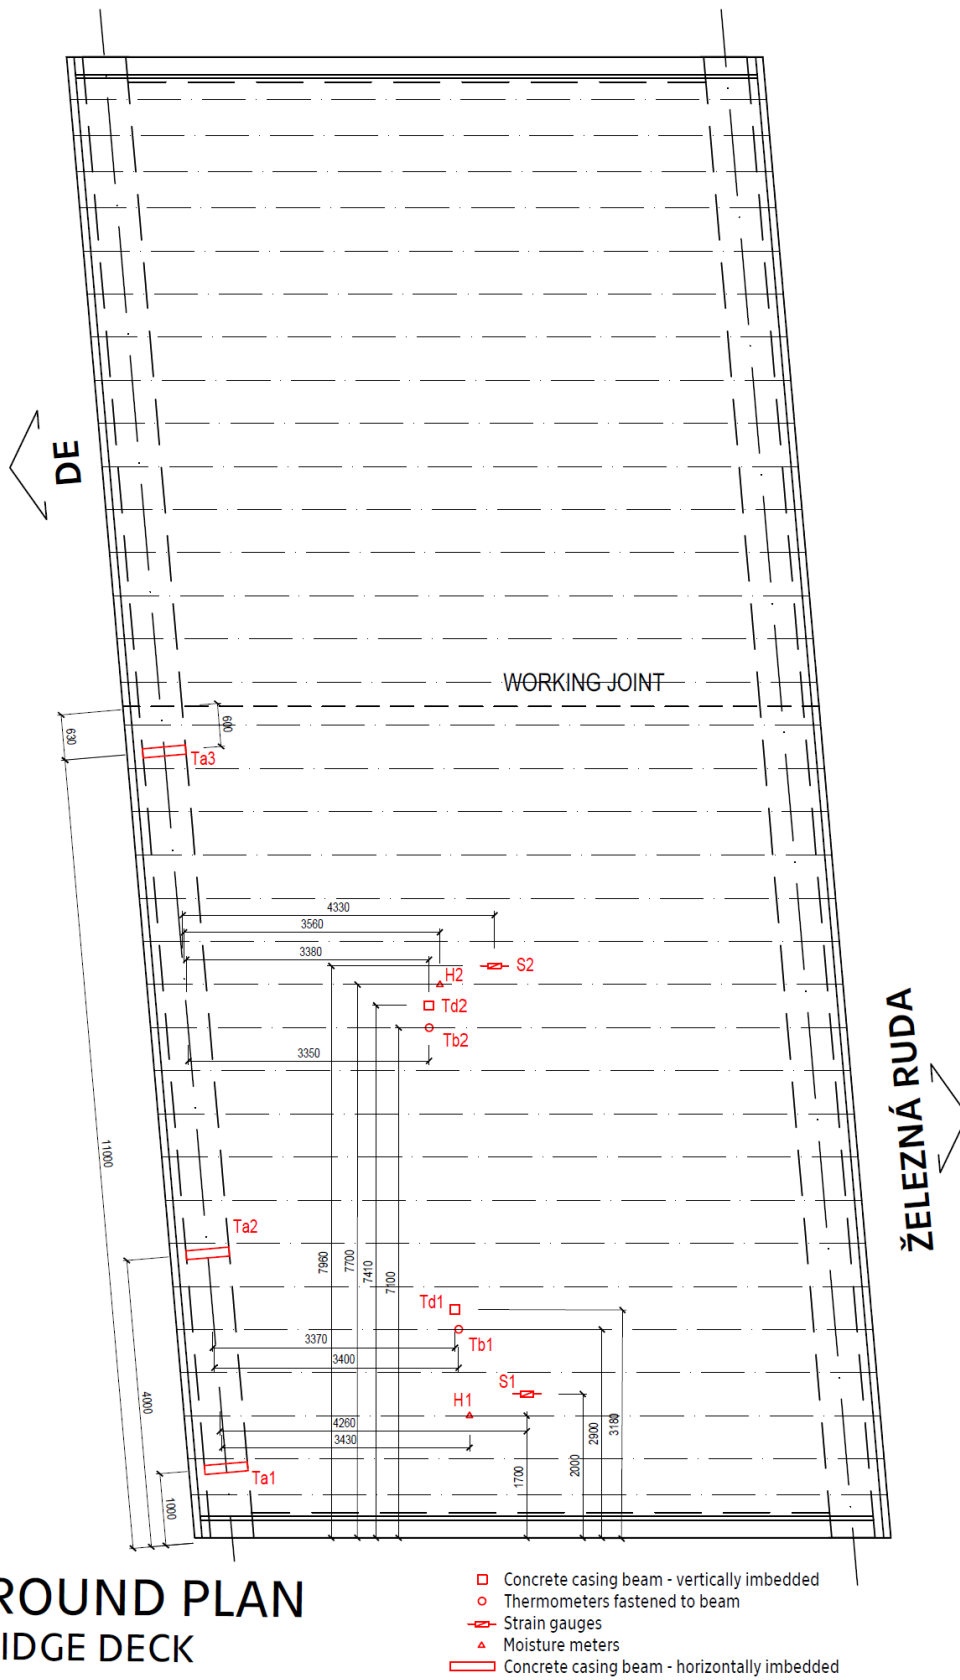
Deployment of sensors in bridge structure marked in ground plan
